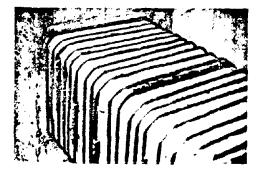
Strengthening using plain steel rod (specimen 3).
